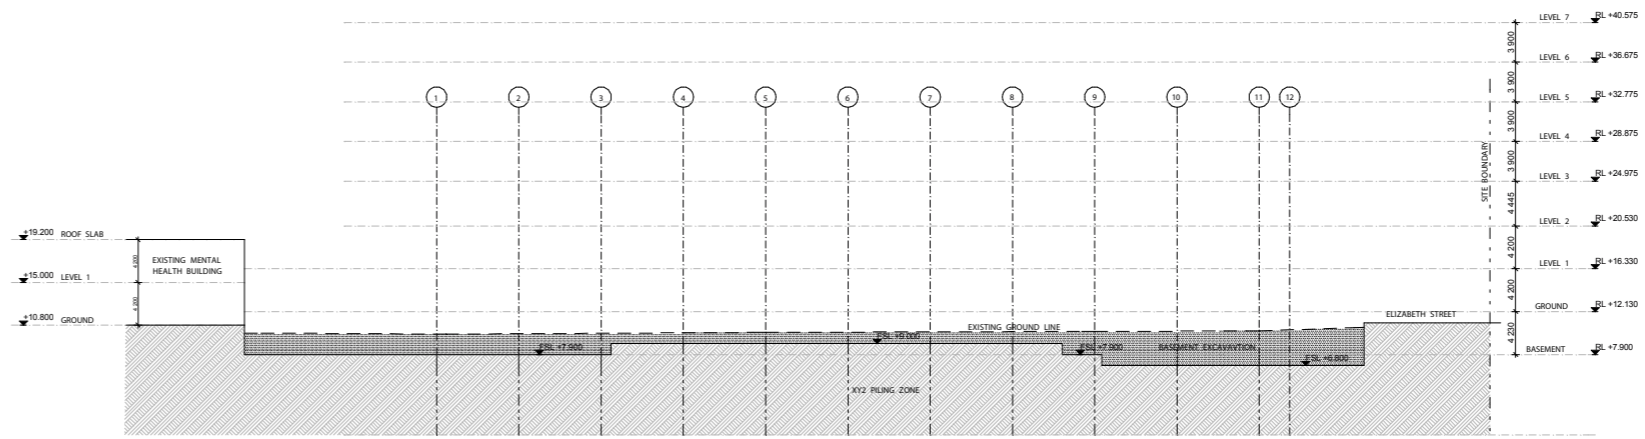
Scope of Excavation and Structural Work up to Ground-Basement Plan
